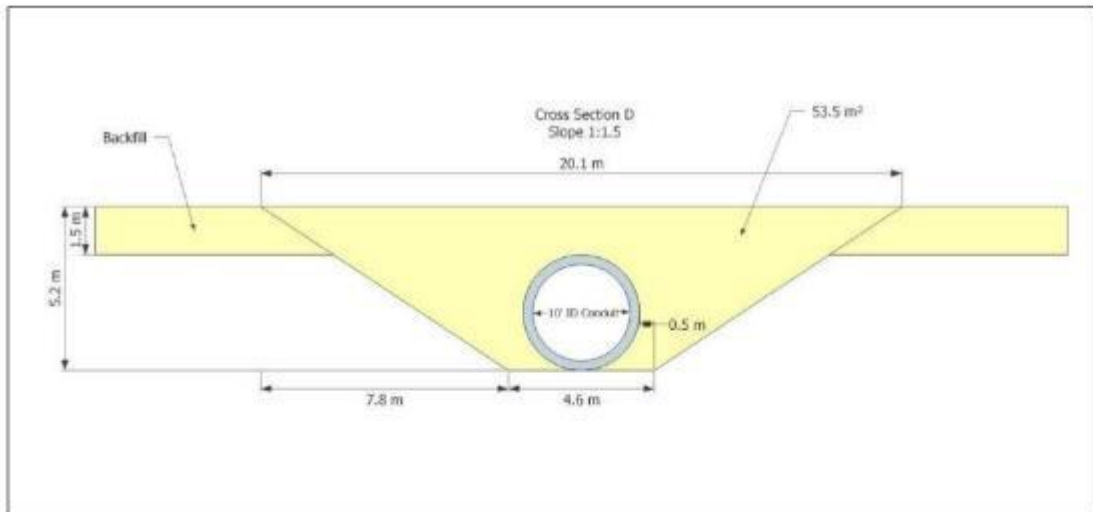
Cross-section D showing trench for removal of 10-ft (3-m) ID discharge conduit with side slope 1:1.5.
